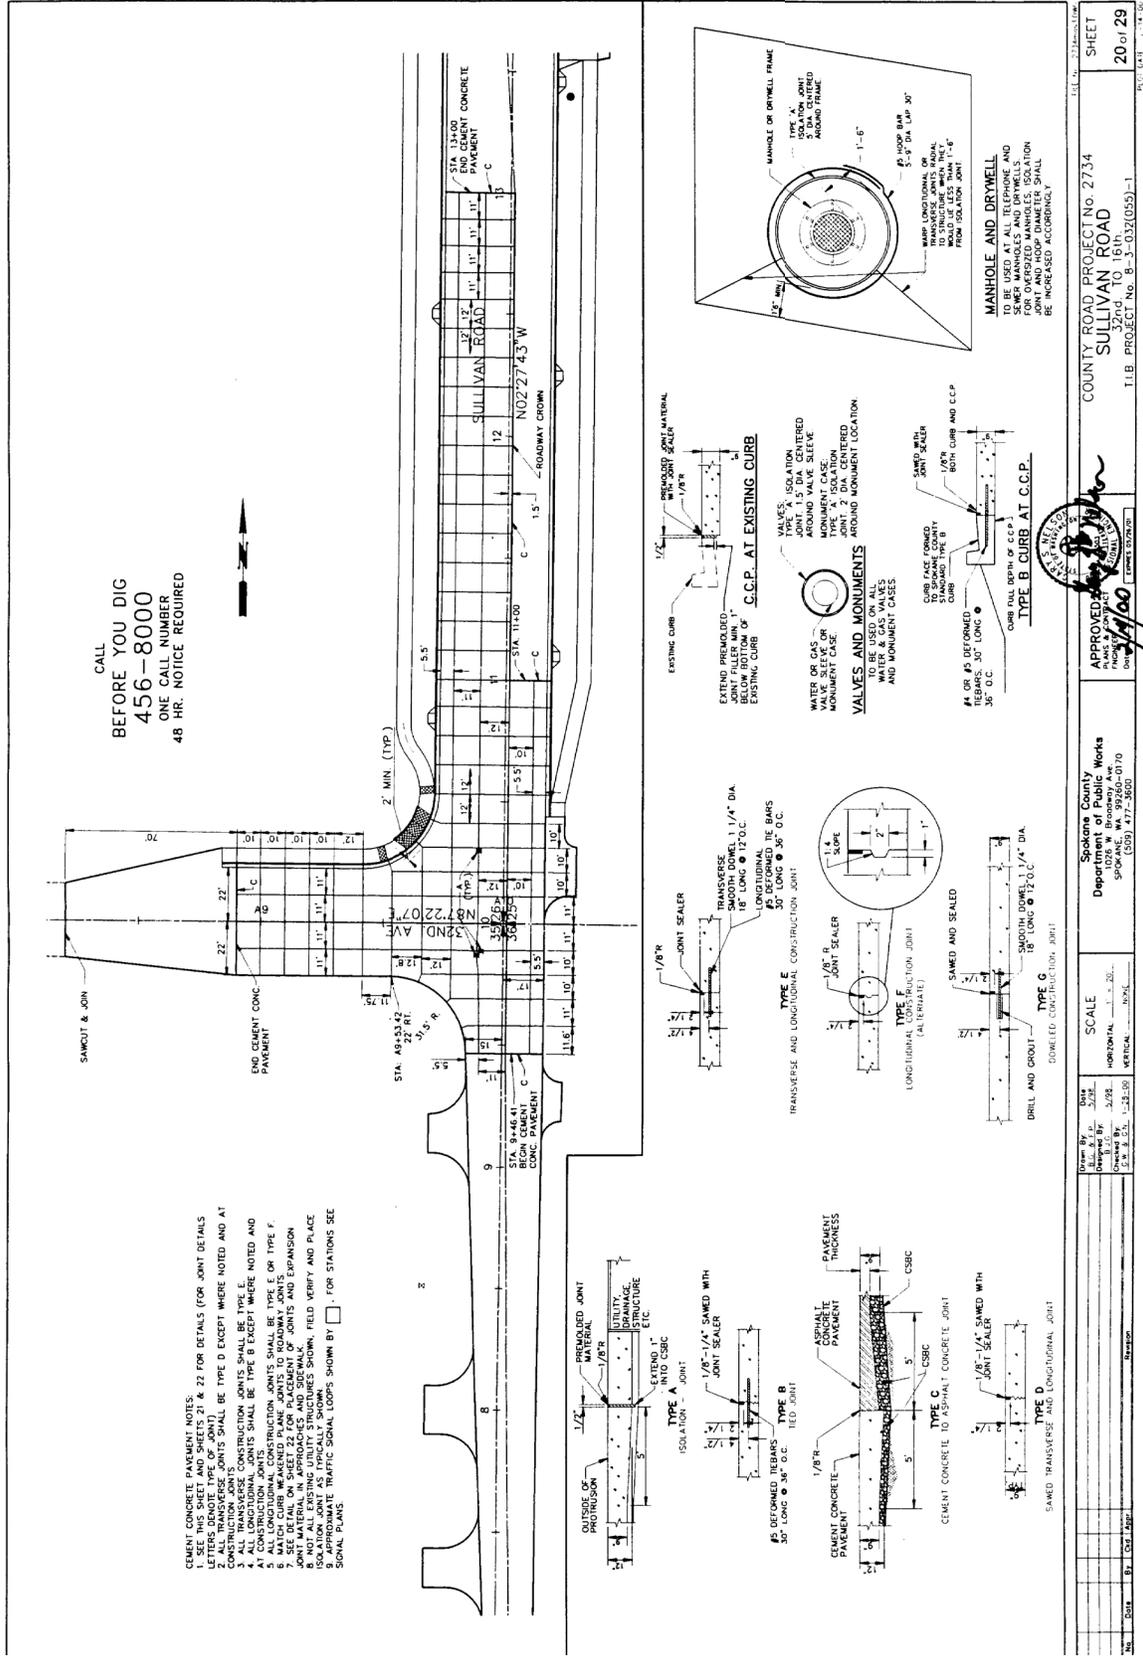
Spokane County jointing plan – Sullivan Road and 32nd Avenue intersection.
